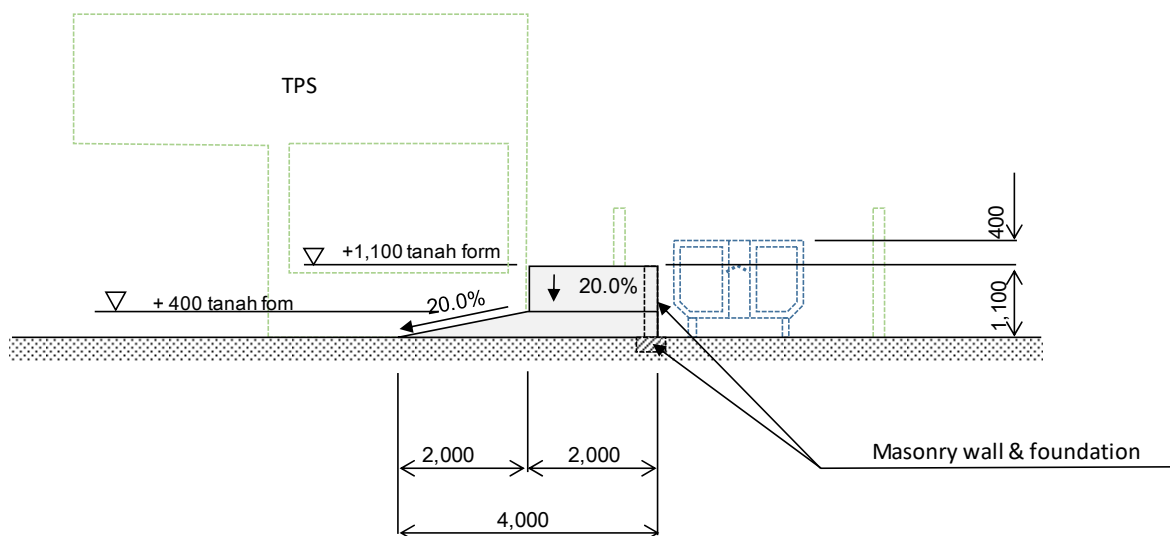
Font and Side View of the Platform of Sepinggan Market
